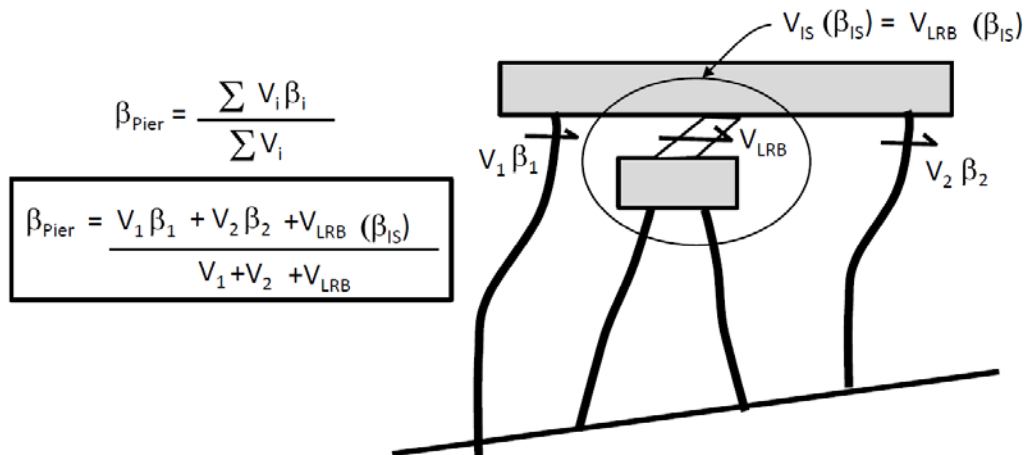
Hysteretic damping for the retrofitted pier (β_{pier}).
